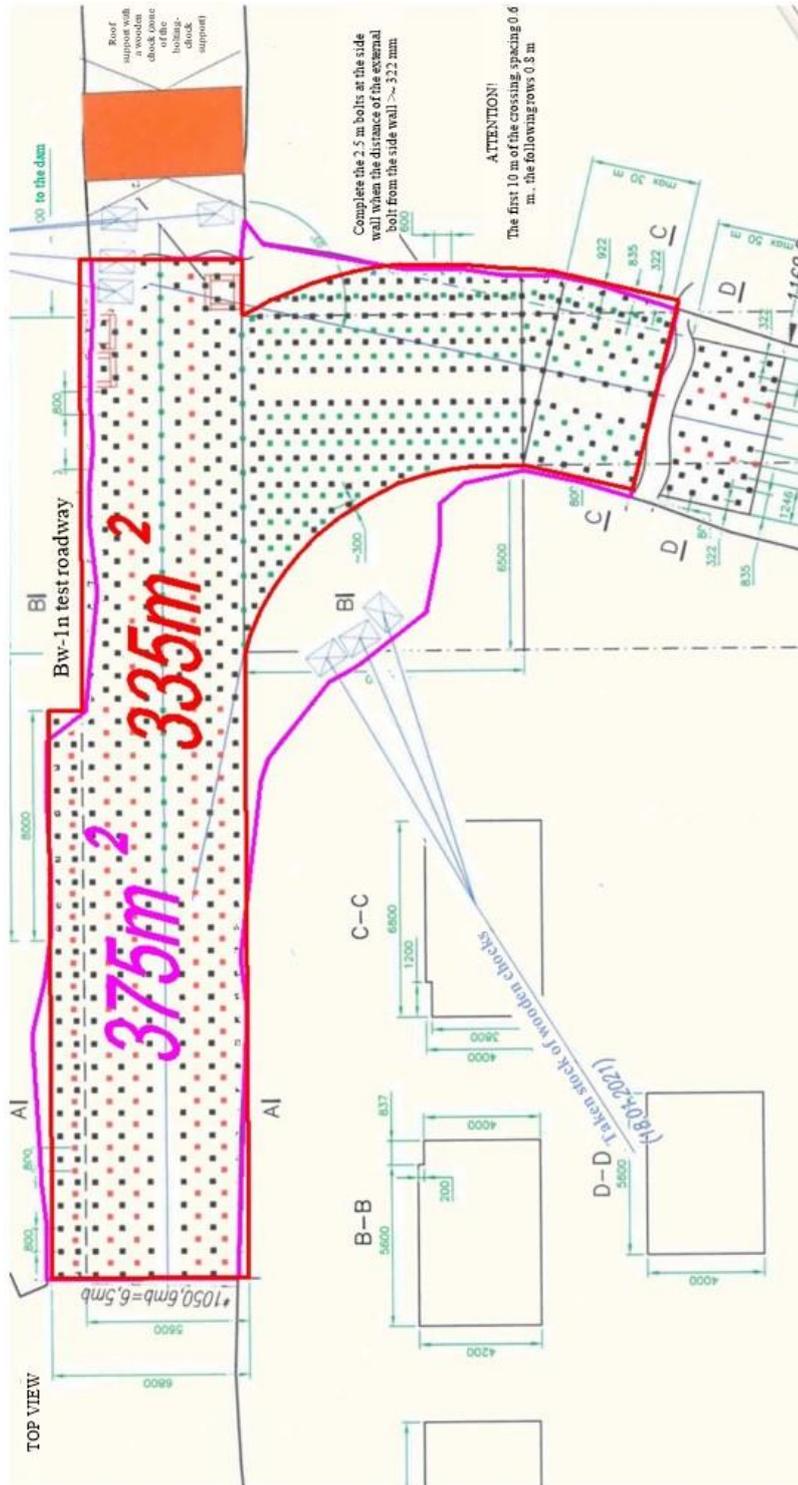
Design of the crossing No. 3 and its real execution in the top view
